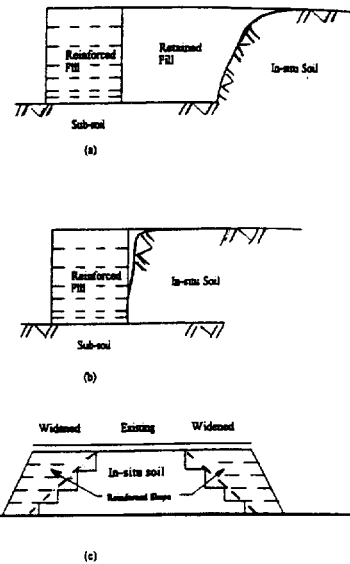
Different sections of reinforced soil structures: (a) with retained fill (b) and (c) without reinforced fill (Pradhan, 1996)
